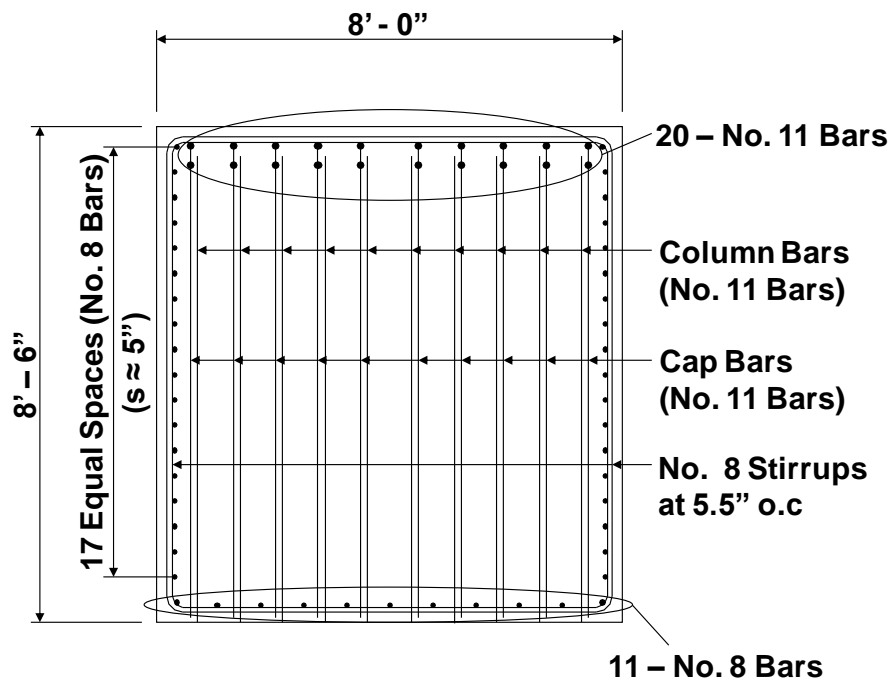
Reinforcement details – elevation (design per proposed STM specifications)
